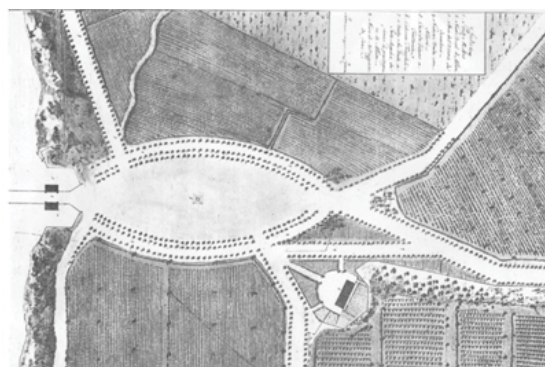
(right) Giuseppe Valadier, Planimetria della sistemazione della Piazza di Ponte Milvio, 1805;
